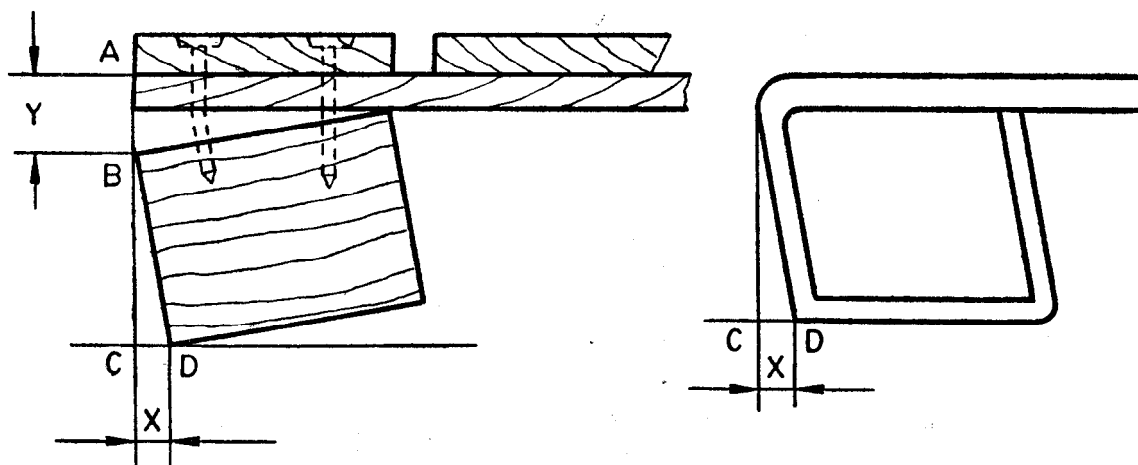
SHEAR TEST-POINTS OF MEASUREMENTS
